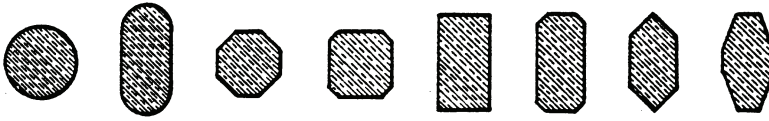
Typical cross-section shapes of piers for overcrossings or viaducts on land.
